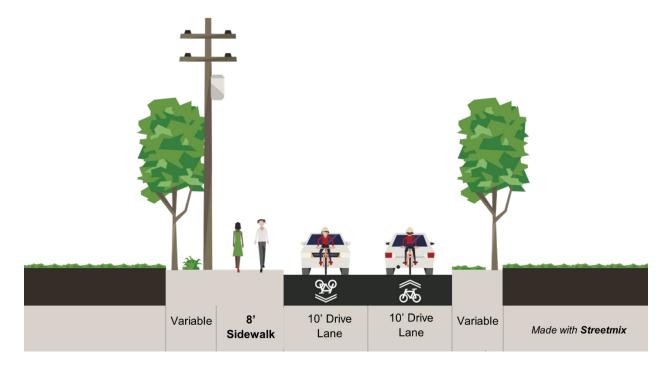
Proposed 20<sup>th</sup> Avenue NW Cross Section showing 8-foot Sidewalk on the West Side
